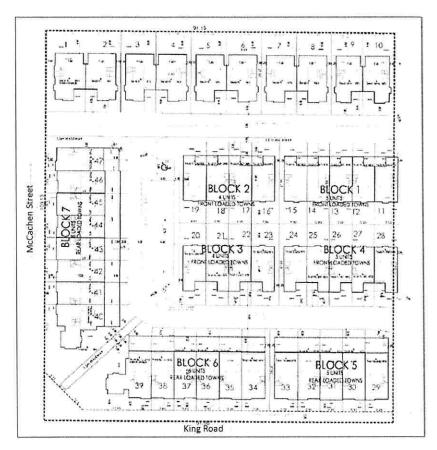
Fifth Avenue Inc. proposed Site Plan
